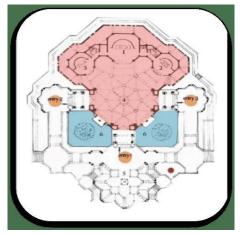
Main hall plan (Source: Isckon Temple Delhi.pdf)
